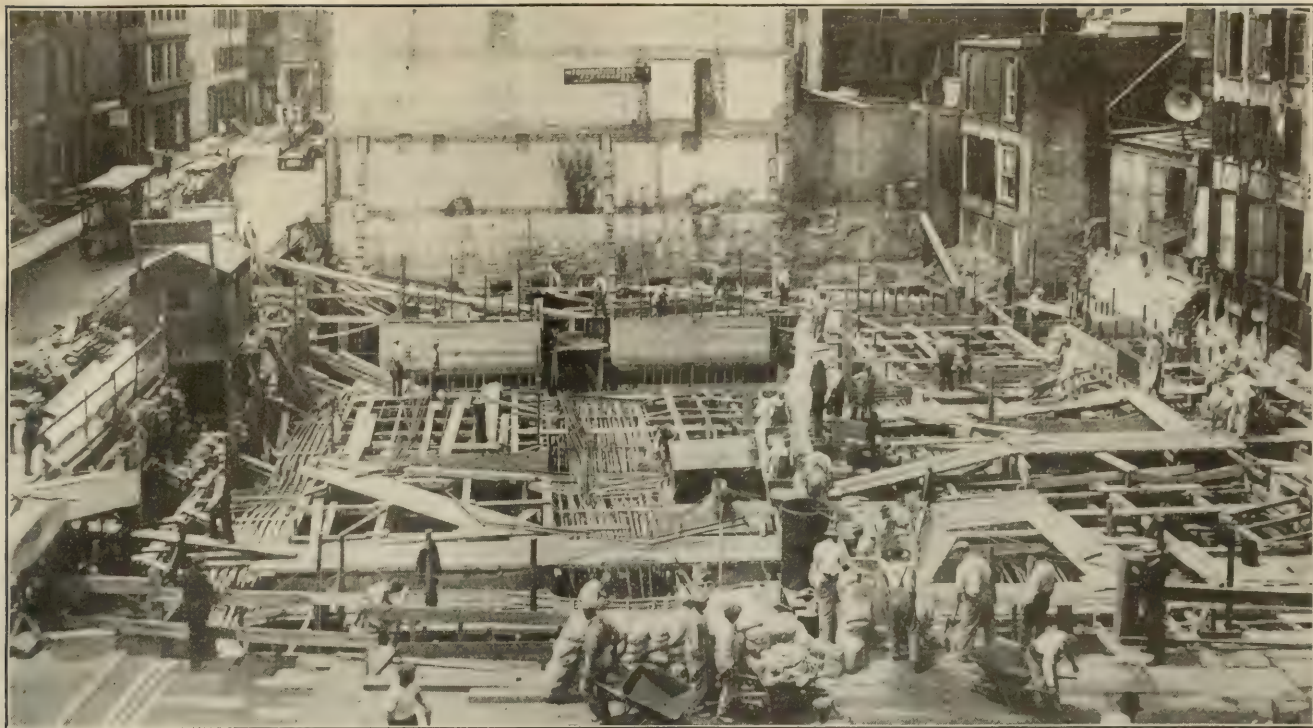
SHOWING HEAVY REINFORCEMENT IN PLACE IN STEAM-PLANT FOUNDATION
